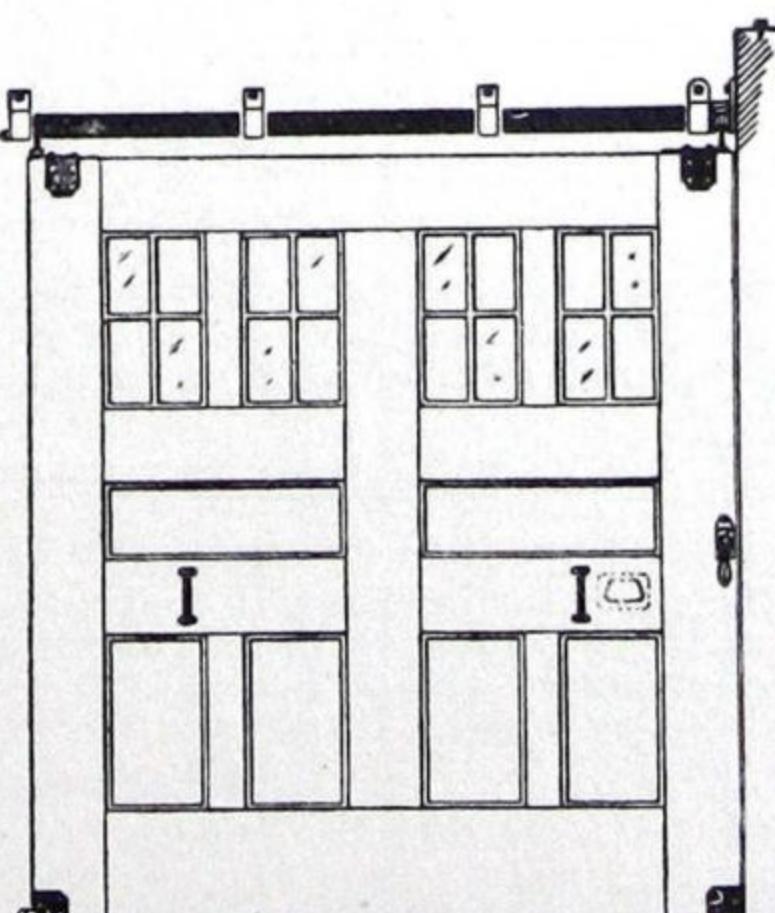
Interior elevation showing Set CC-3, including one 516 Door Bolt.
